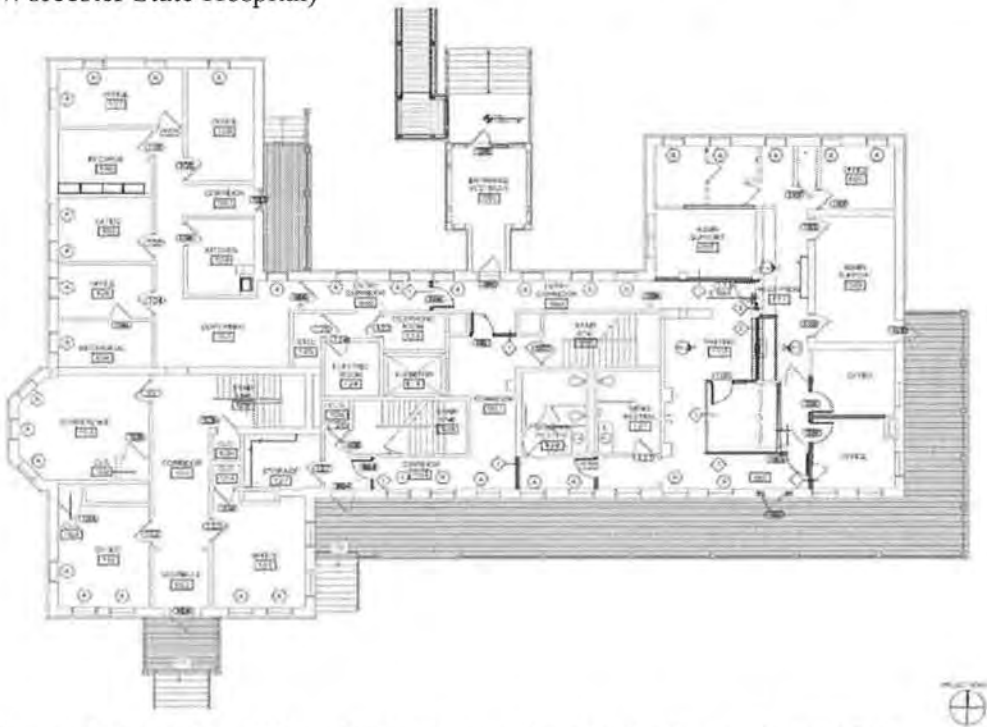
, First-Floor Plan (2014, courtesy Cambridge Seven Associates)
